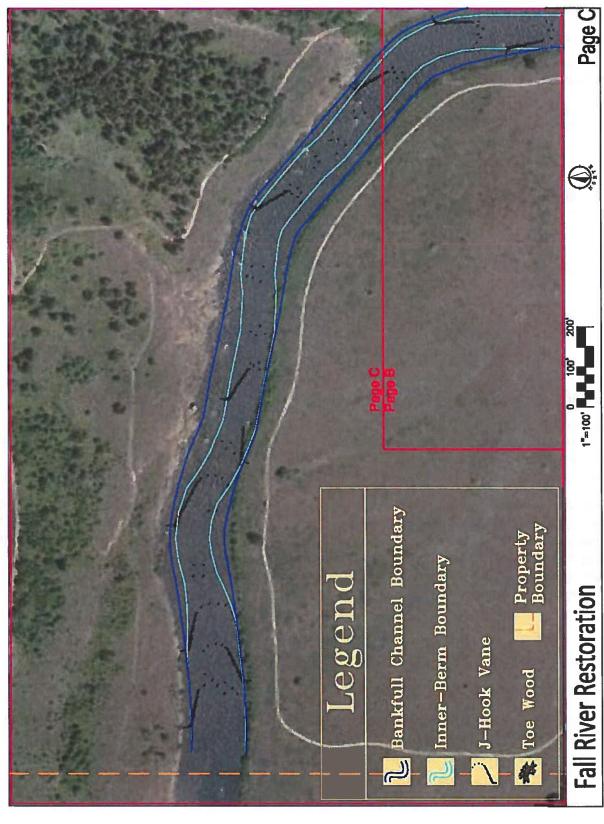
Plan view detail of the proposed fish habitat enhancement for Fall River for the enlarged-scale, Page C plan sheet.
